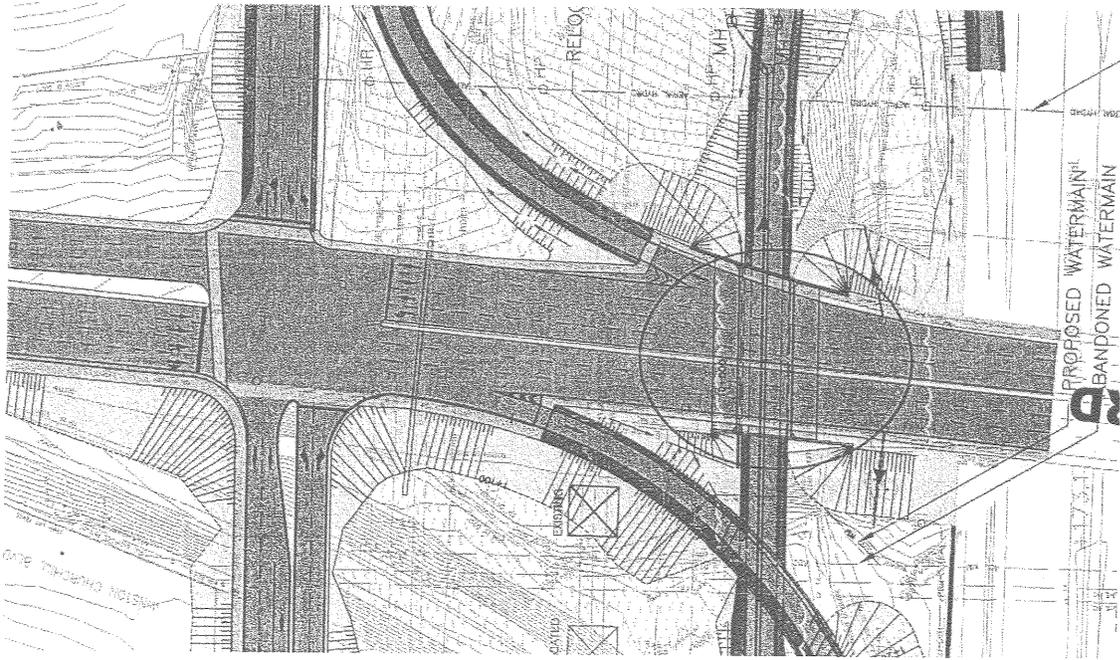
Noise Wall Plan – Hurontario to Central Parkway
